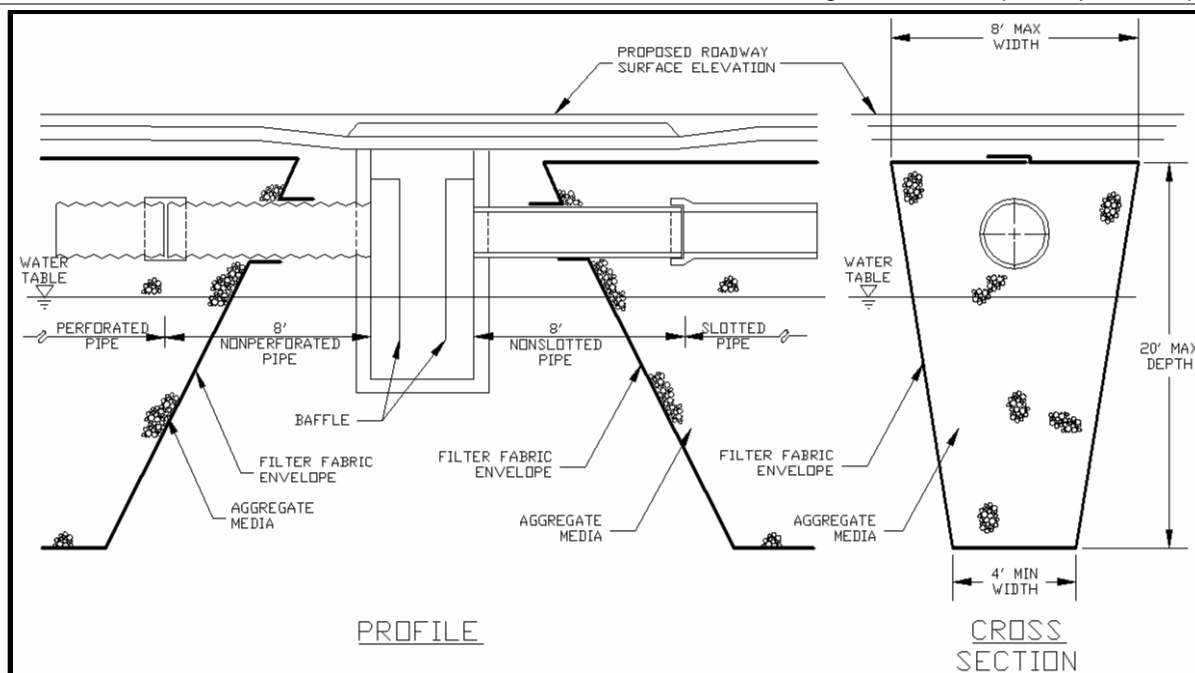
Typical Profile & Section View of an infiltration Trench
